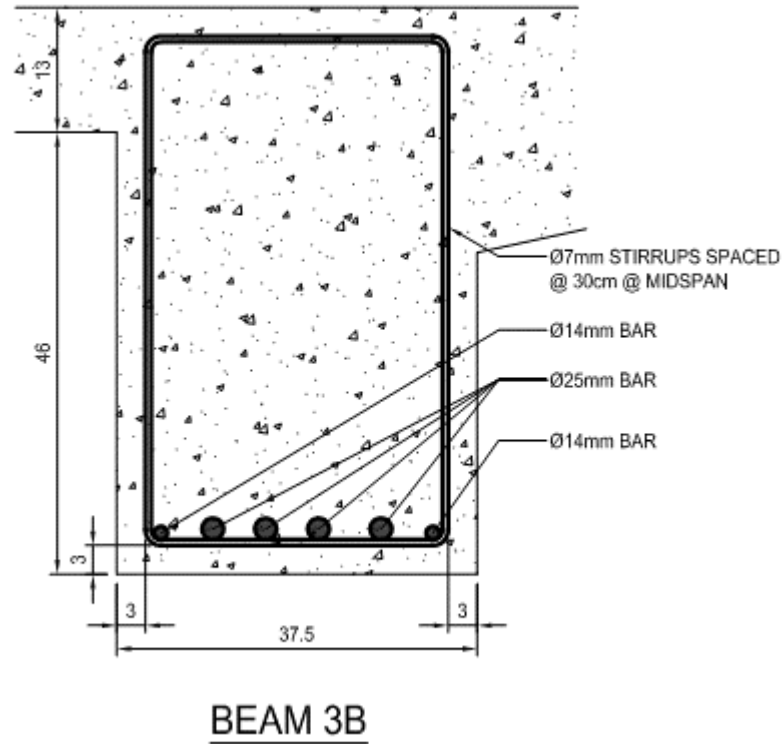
Beam 3B Cross Section with dimensions in centimeters [16]
